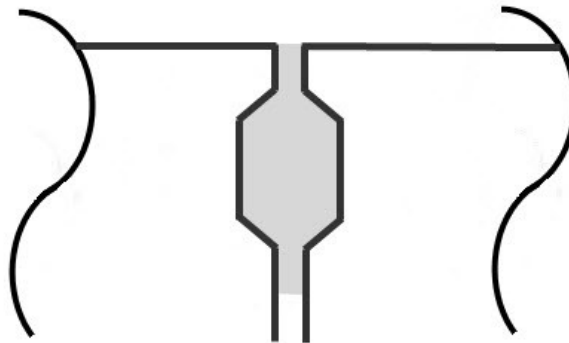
Shear Key Joint with Non-Shrink Grout Schematic
